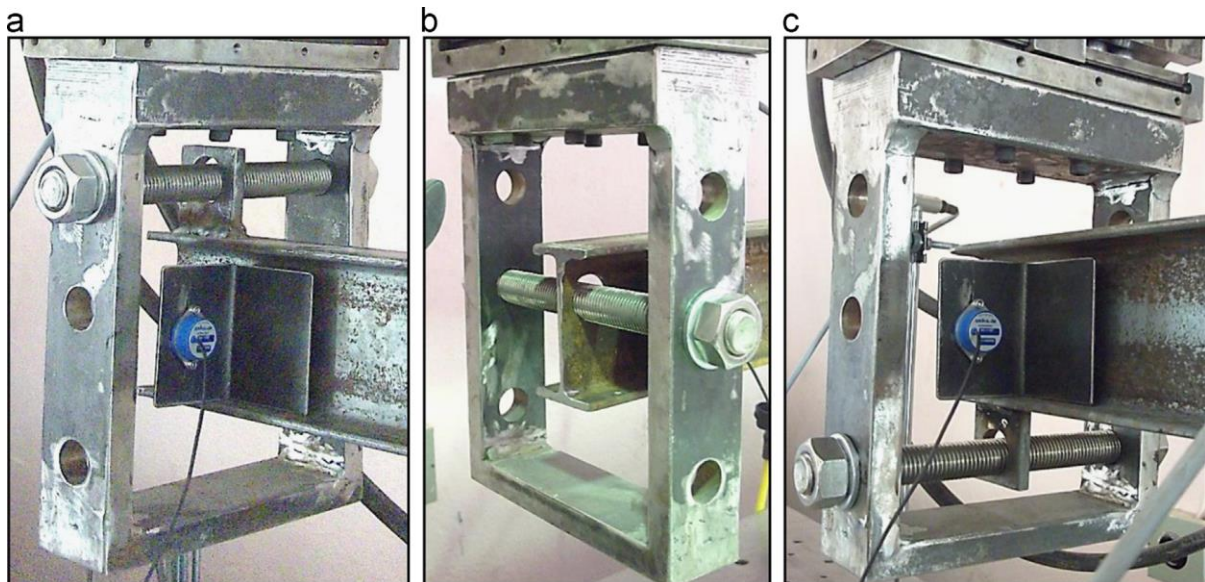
Loading positions of a) top flange, b) shear centre and c) bottom flange (Ozbasaran *et al.*, 2015).
